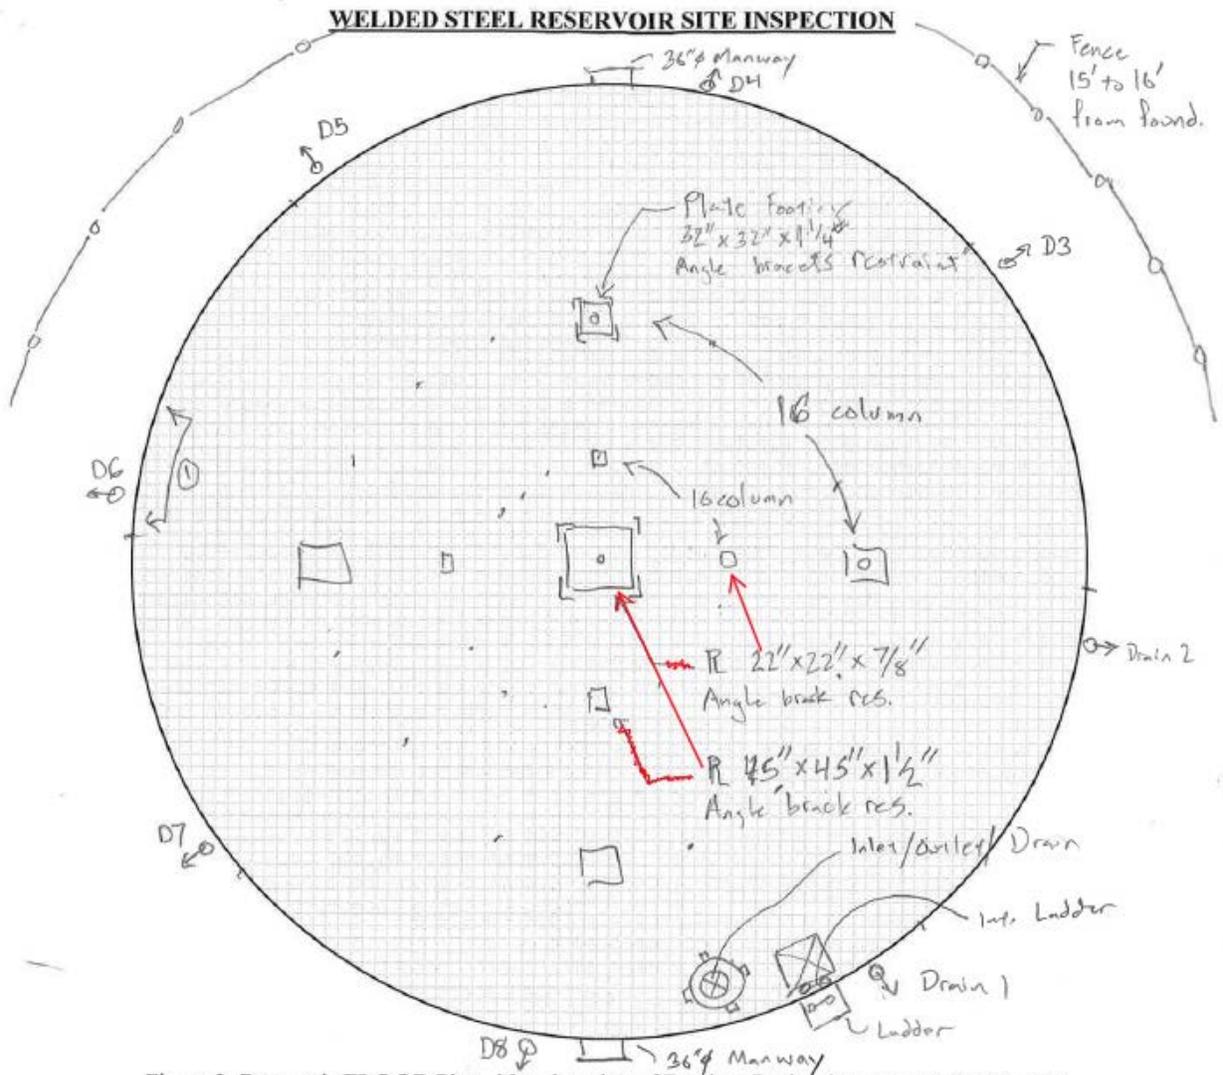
Reservoir FLOOR Plan –Note location of Footing, Drain Pipes, Manways, etc. List given and measured diameter.
